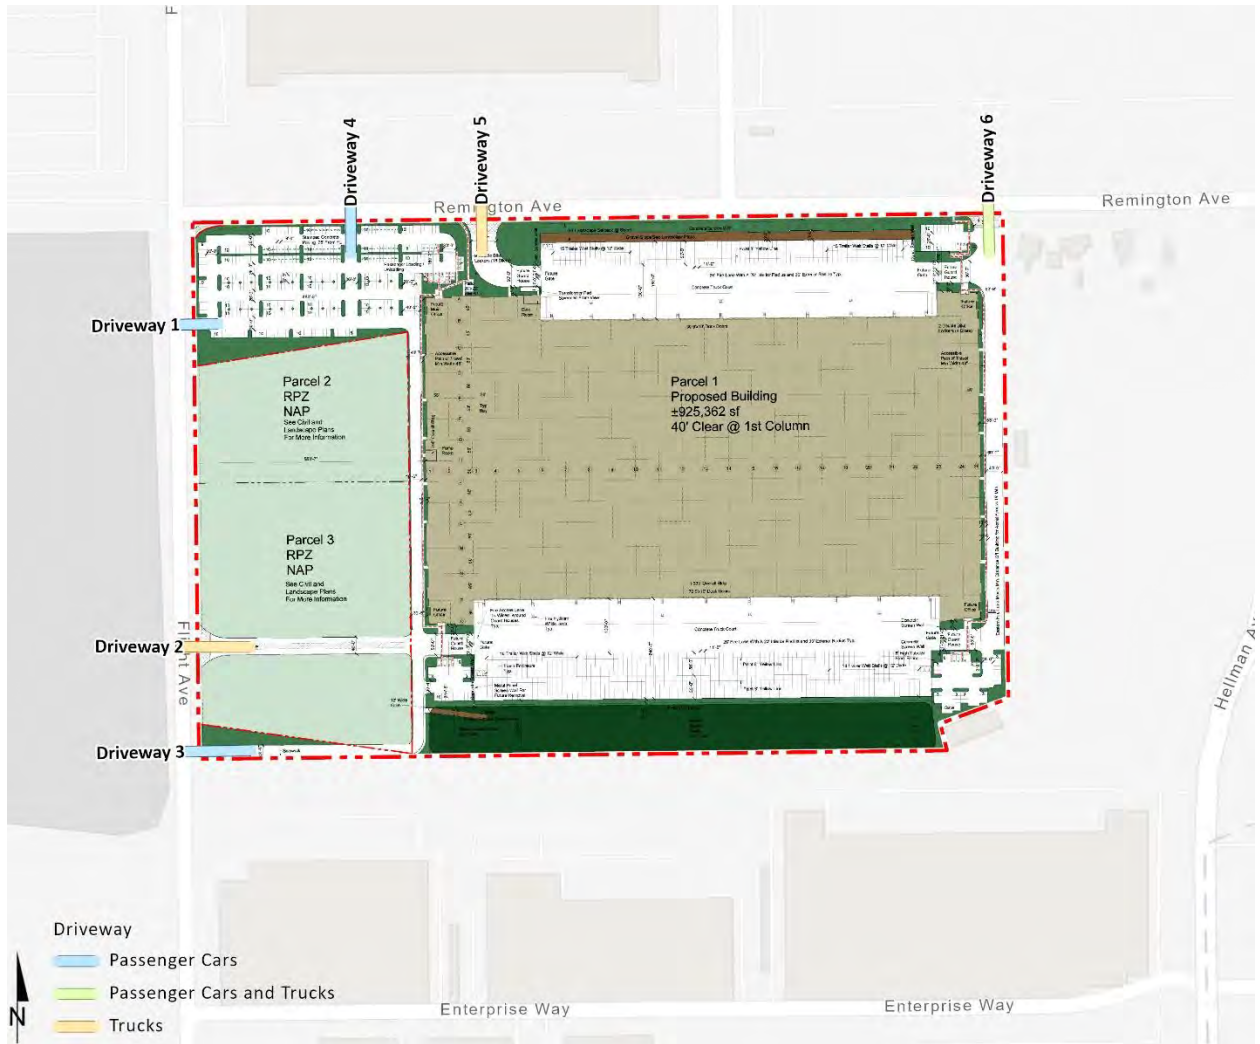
PRELIMINARY SITE PLAN
